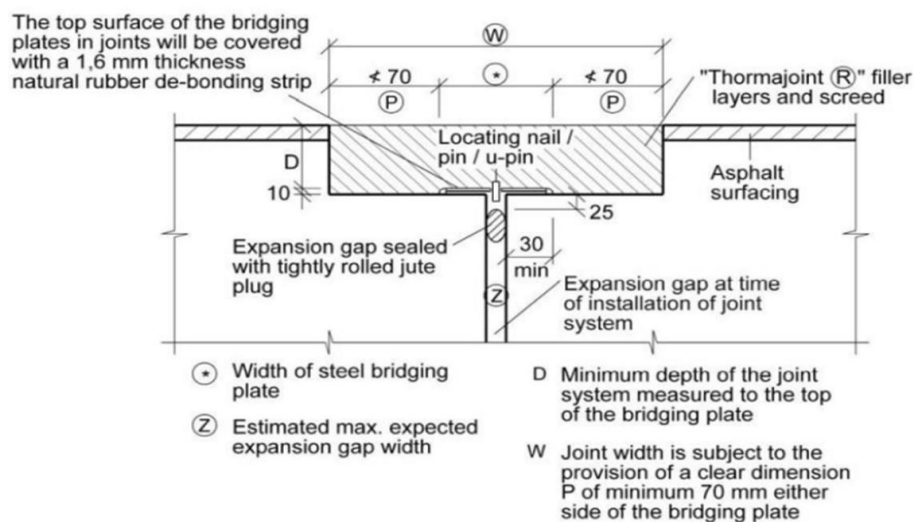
Asphaltic Plug Joint (APJ) on bridge deck surface
